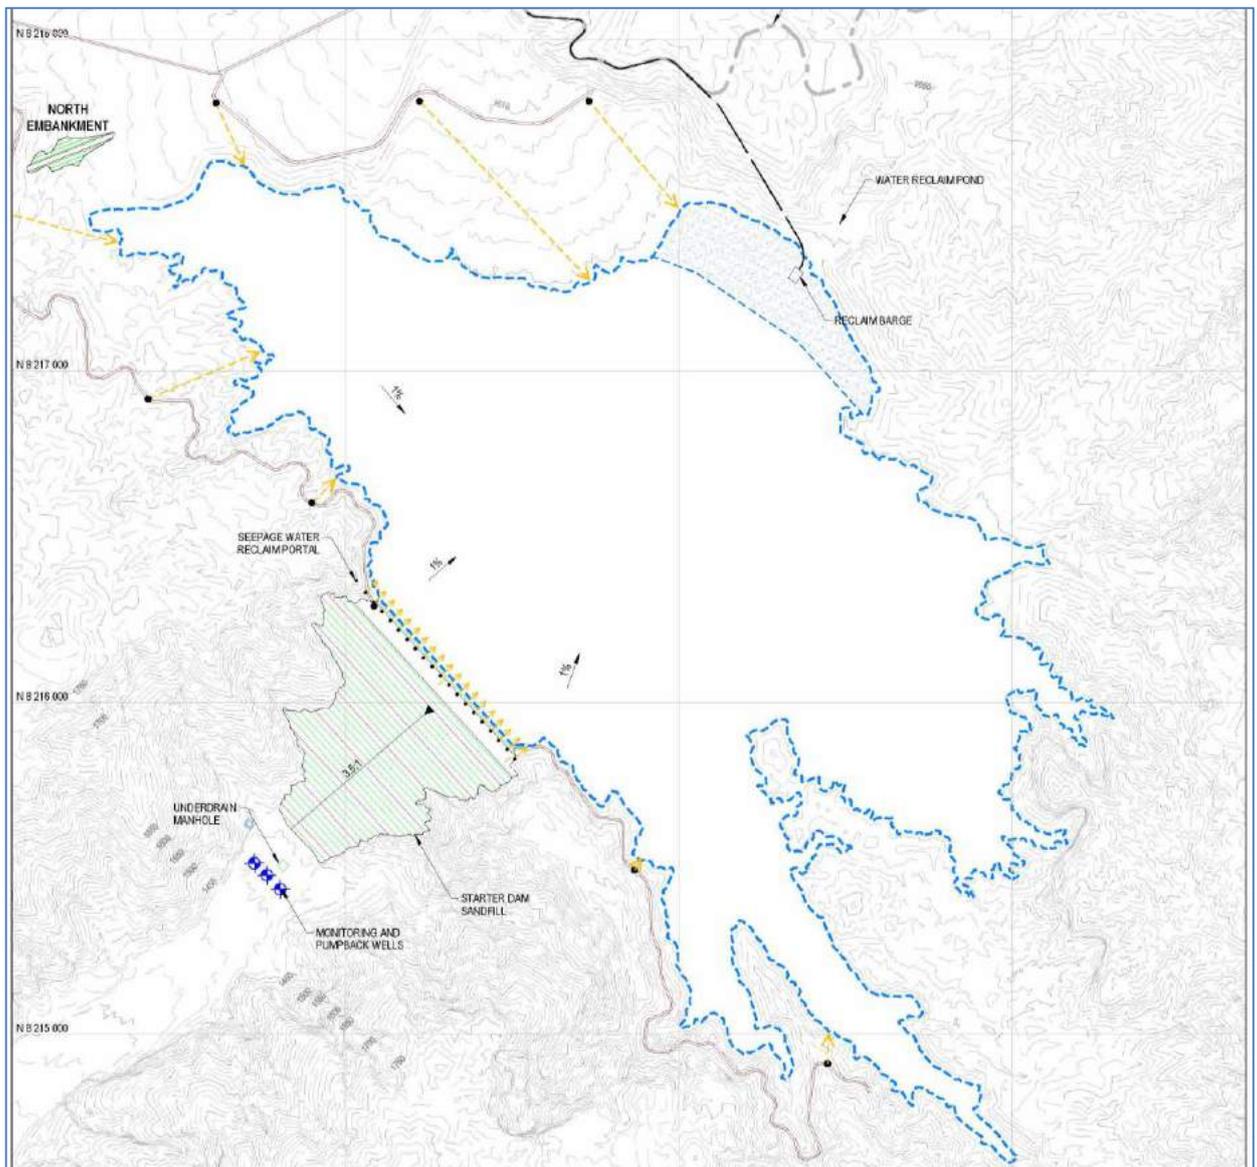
TMF tailings deposition Year 10 showing starter northwest embankment
